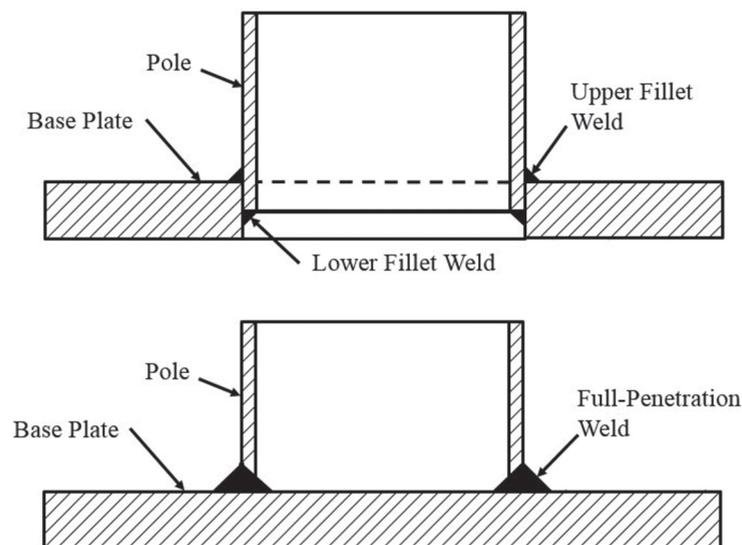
Typical HMLT base connection details: welded-through socket (top) and full-penetration weld (bottom).
